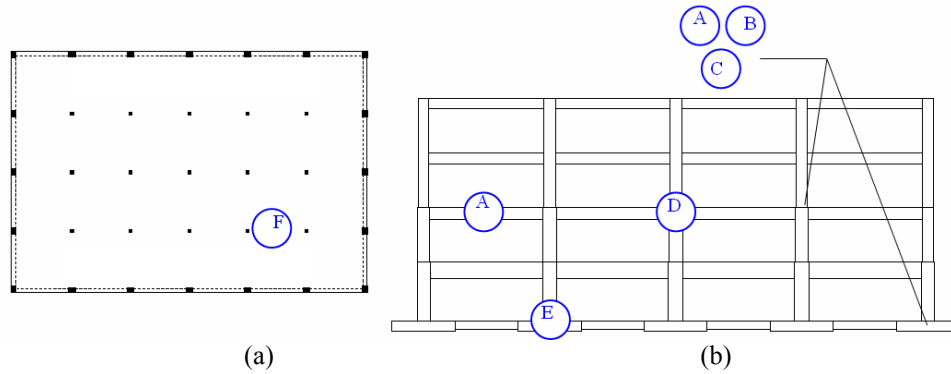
RC frame building (a) plan and (b) elevation views, showing location of possible deterioration modes.
